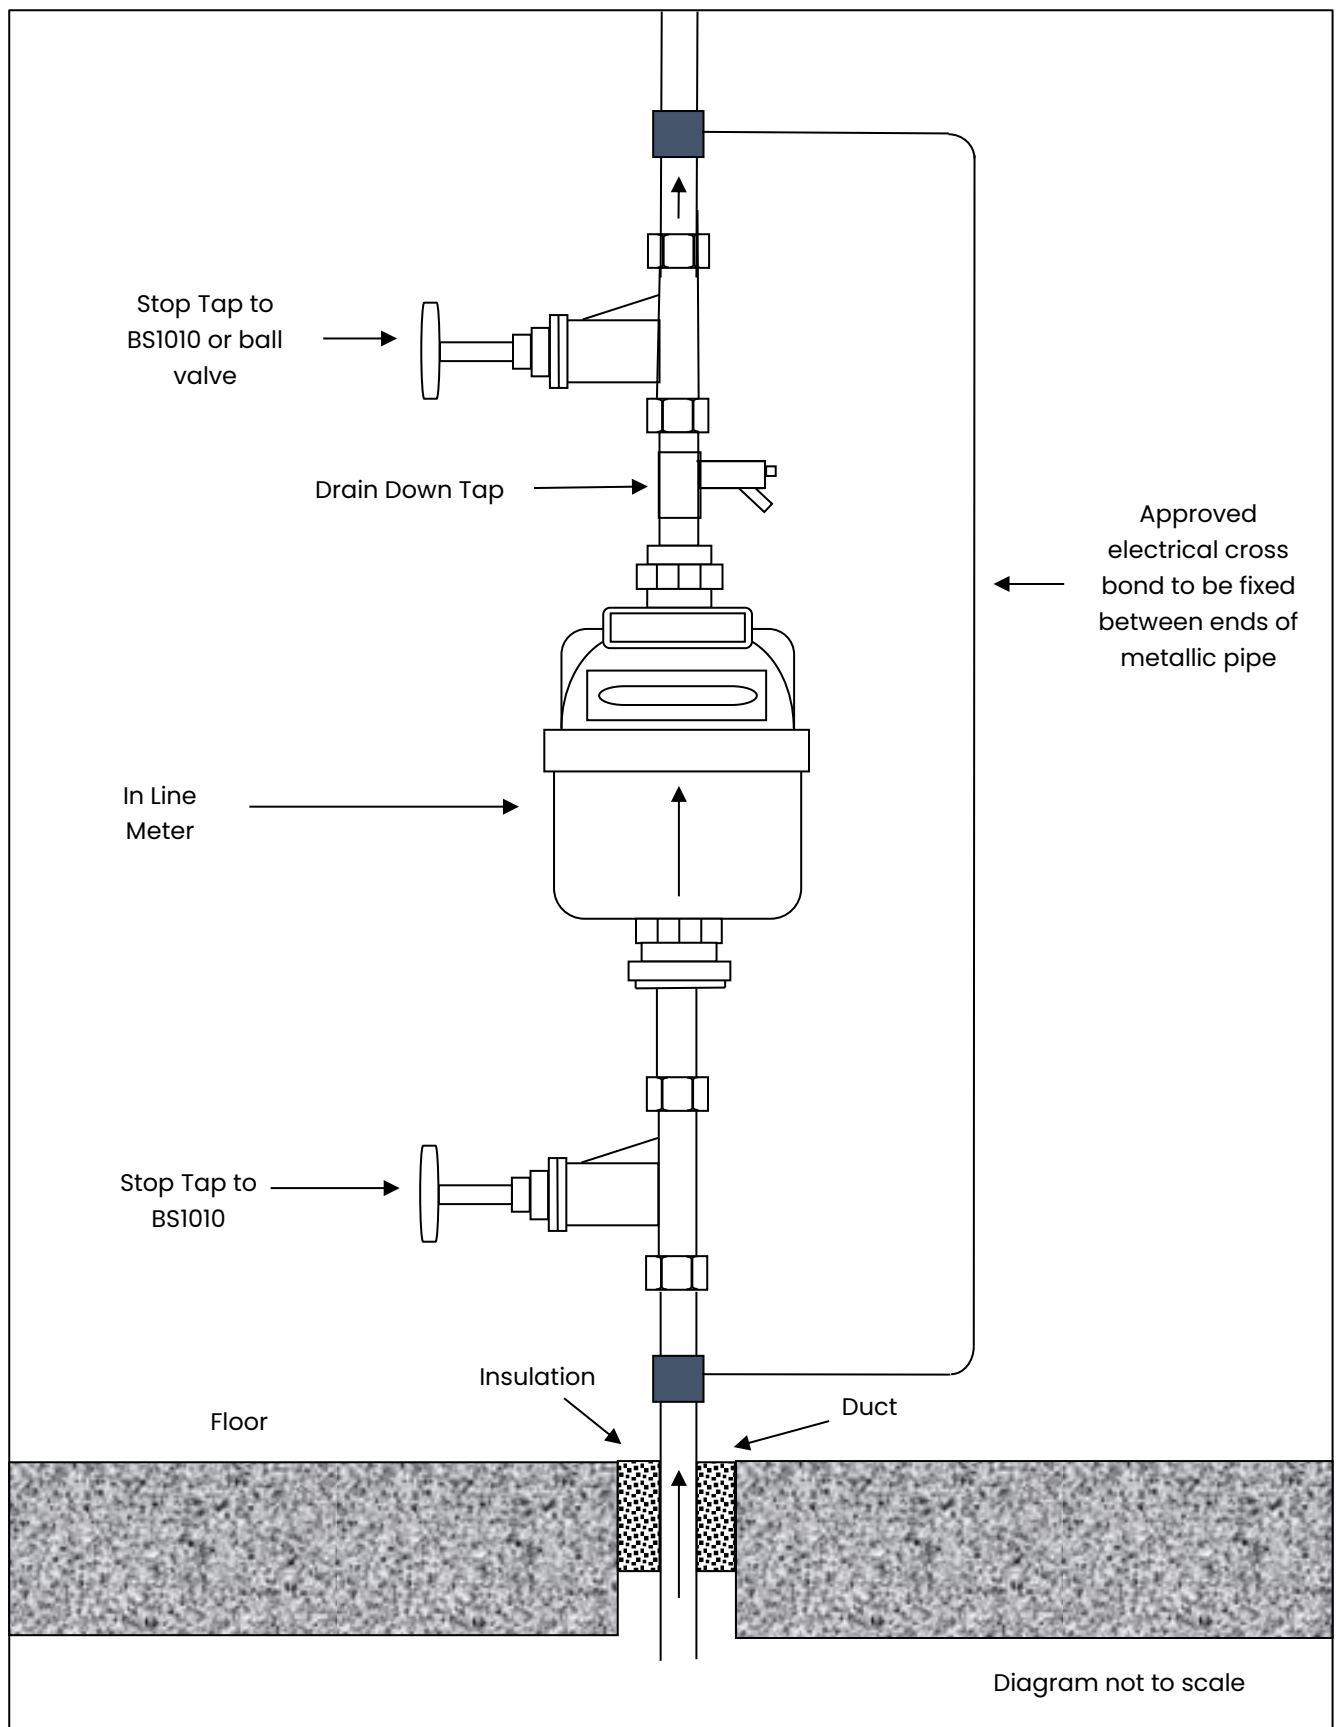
Standard Drawing for an Internal In-Line 20 mm – 39 mm Meter Installation
